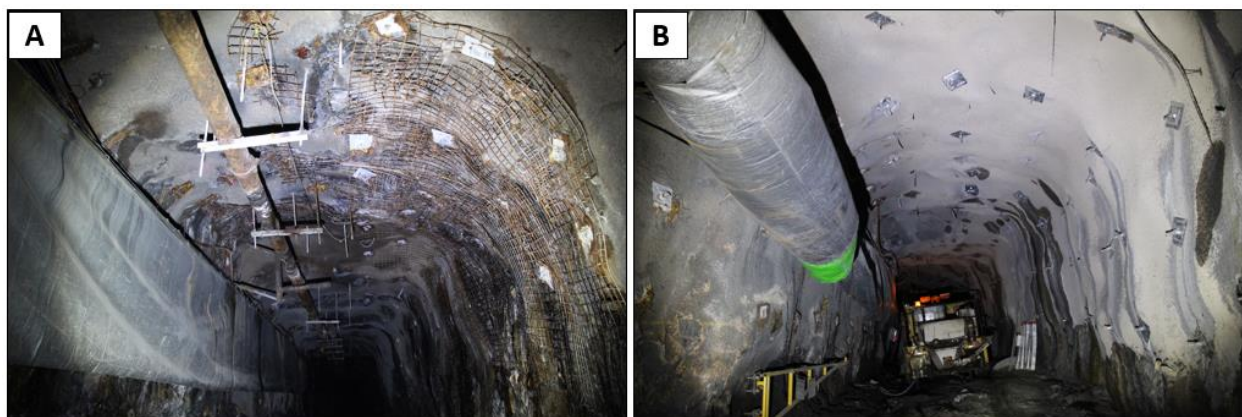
12 LEVEL PASTE DRIVE – BEFORE (A) AND AFTER (B) REHABILITATION WORKS WITH NEW PASTE DELIVERY PIPING BEING INSTALLED
